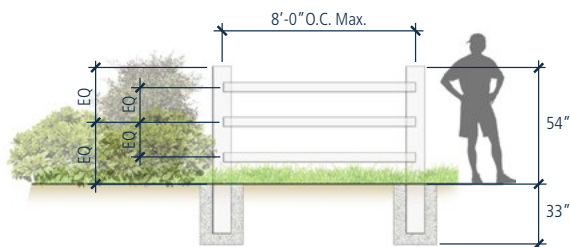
CONCEPTUAL WALL AND FENCE PLAN
